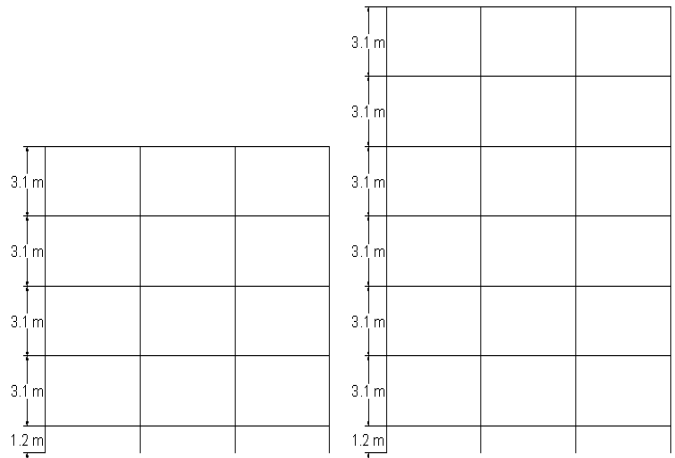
(a) Elevation view of G+3 and G+5 building frame.
